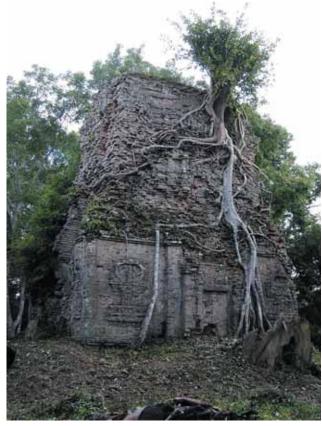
Loose and fragmentation of brickwork of roof part (W shrine in Prasat Kouktroung, M.41).
